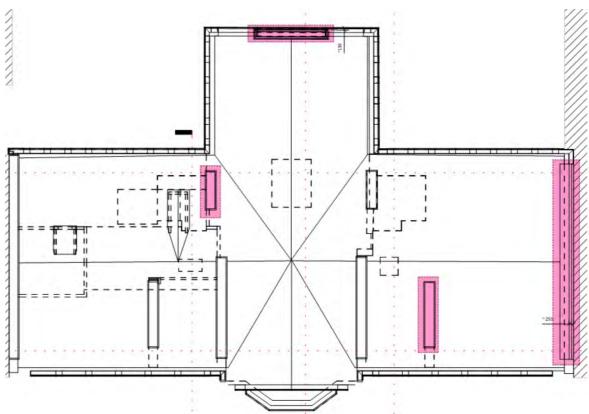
Roof plan with Chimneys thought to be deflection excessively highlighted in pink
